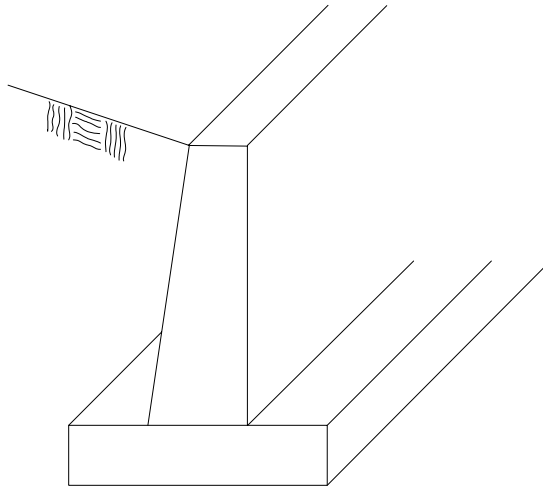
Footing for a semi-gravity cantilever retaining wall (FHWA, 2002c).
